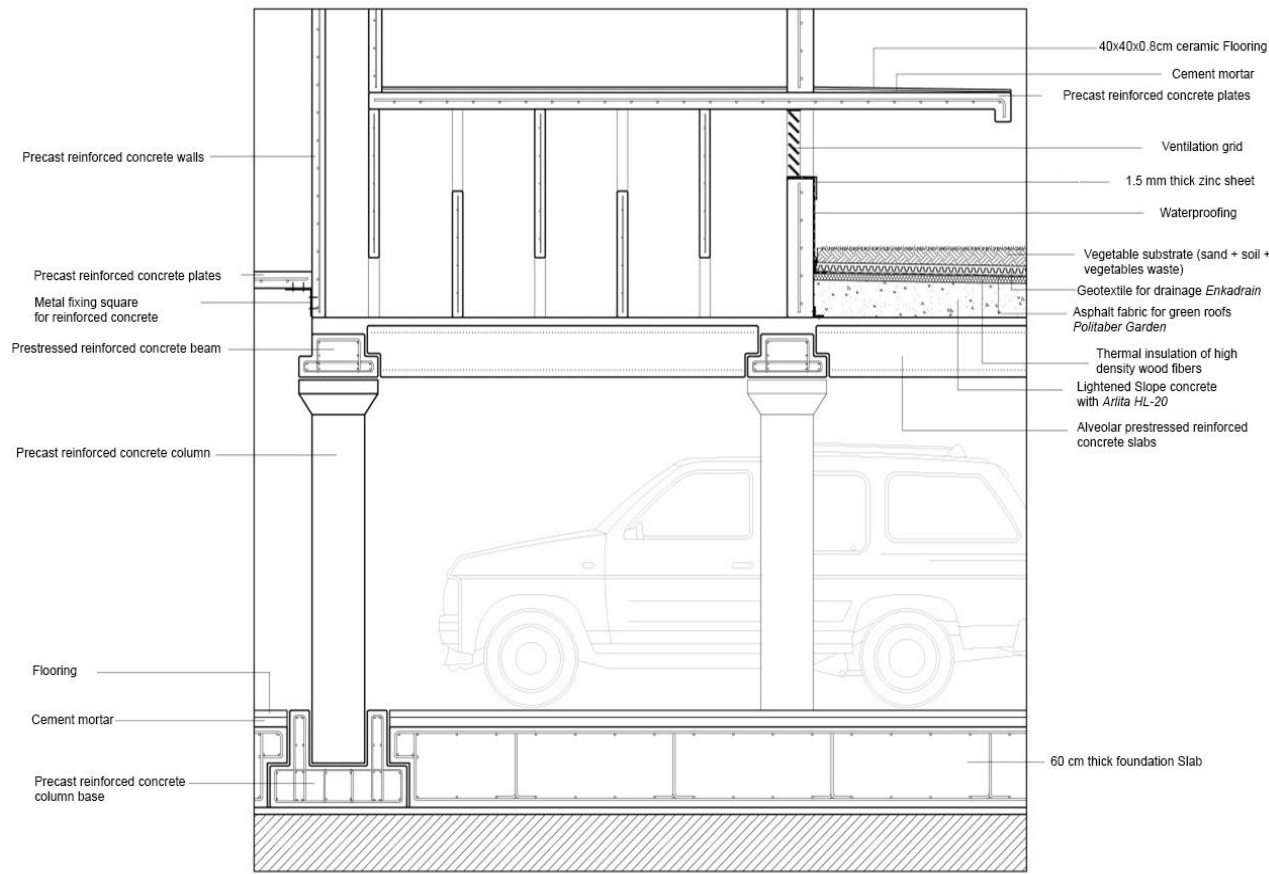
Construction detail of the base structure of the *Sayab* building.
